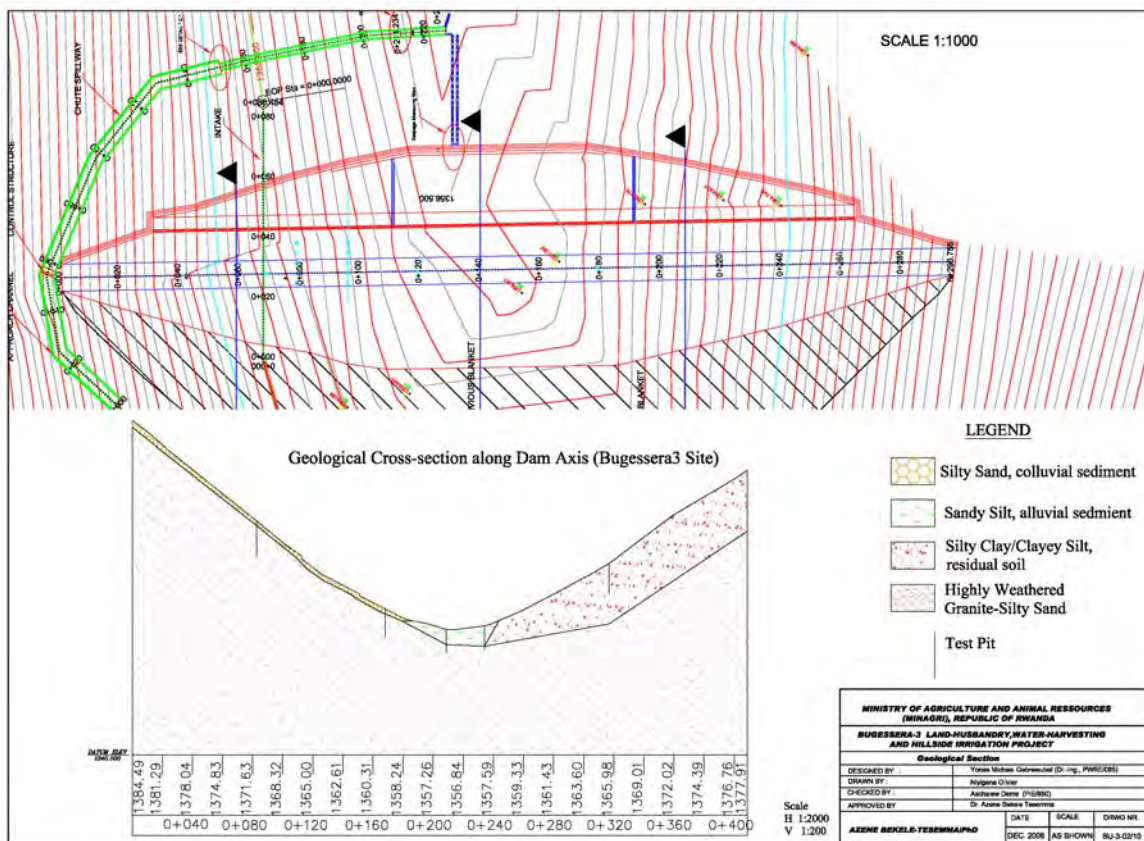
Longitudinal section and plan of dam axis (LWH design Report)
